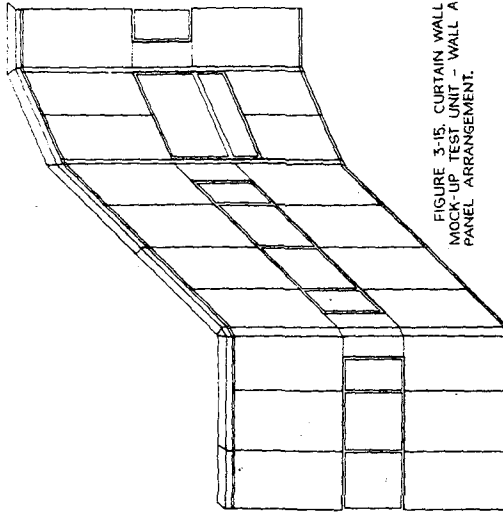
CURTAIN WALL MOCK-UP TEST UNIT - WALL AND PANEL ARRANGEMENT.
